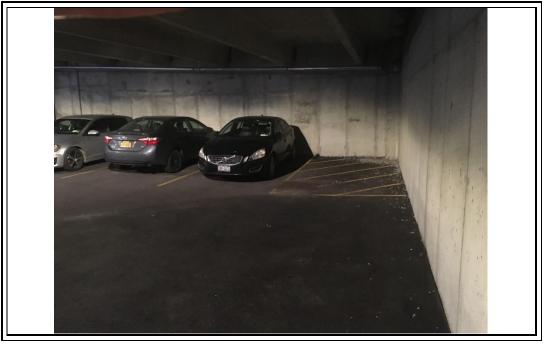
Looking northwest; paved surface cover and storm drain (center of photo) within the northwest corner of the lowest level of the parking garage (12/10/18).
